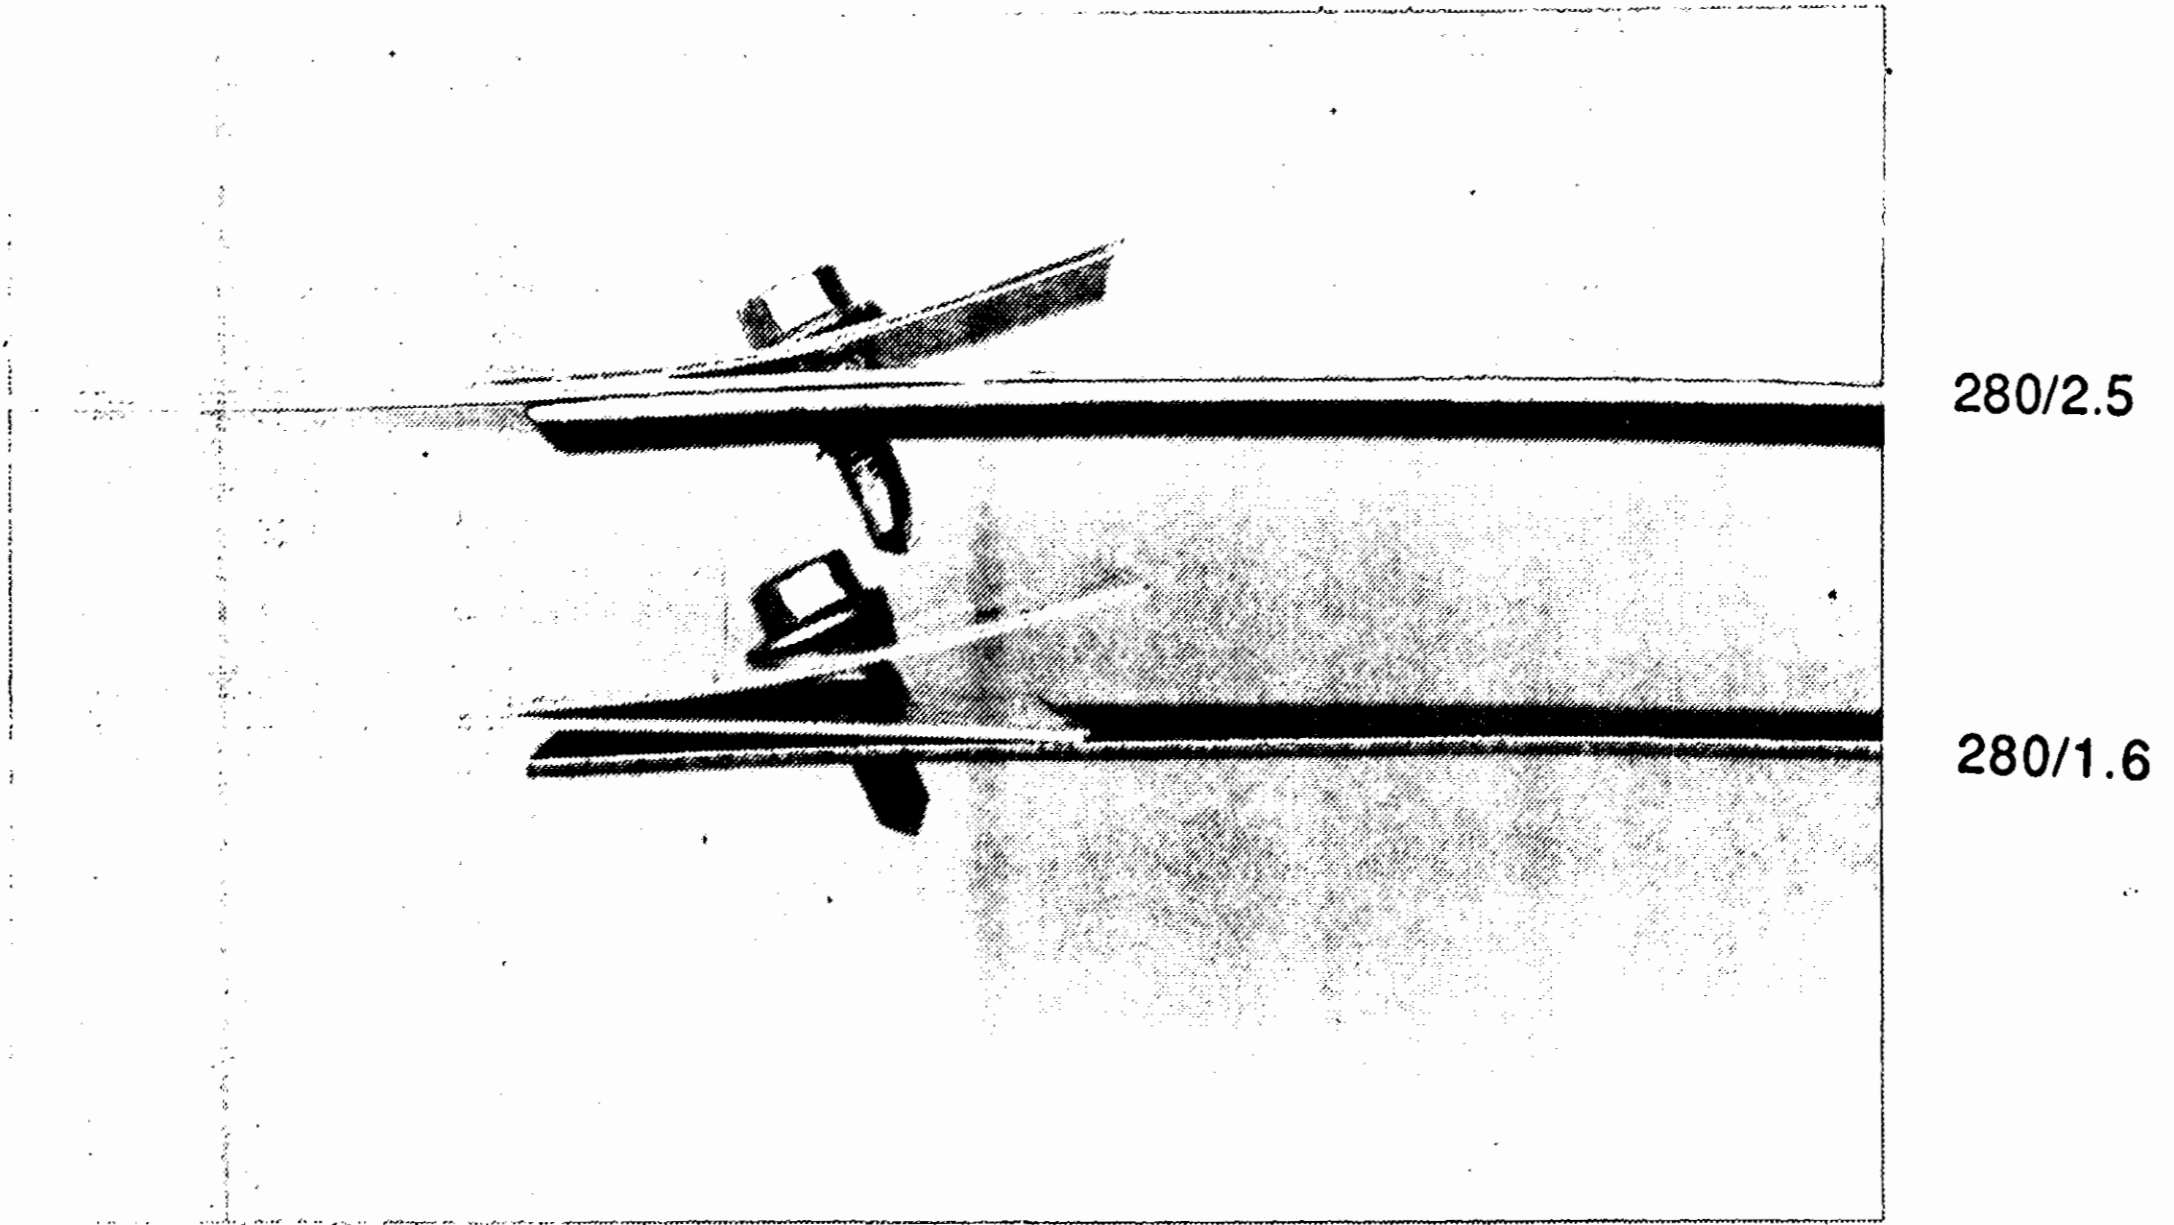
Sheet (0.55 mm)-to-purlin connections (14g neo) after pull-out tests.
